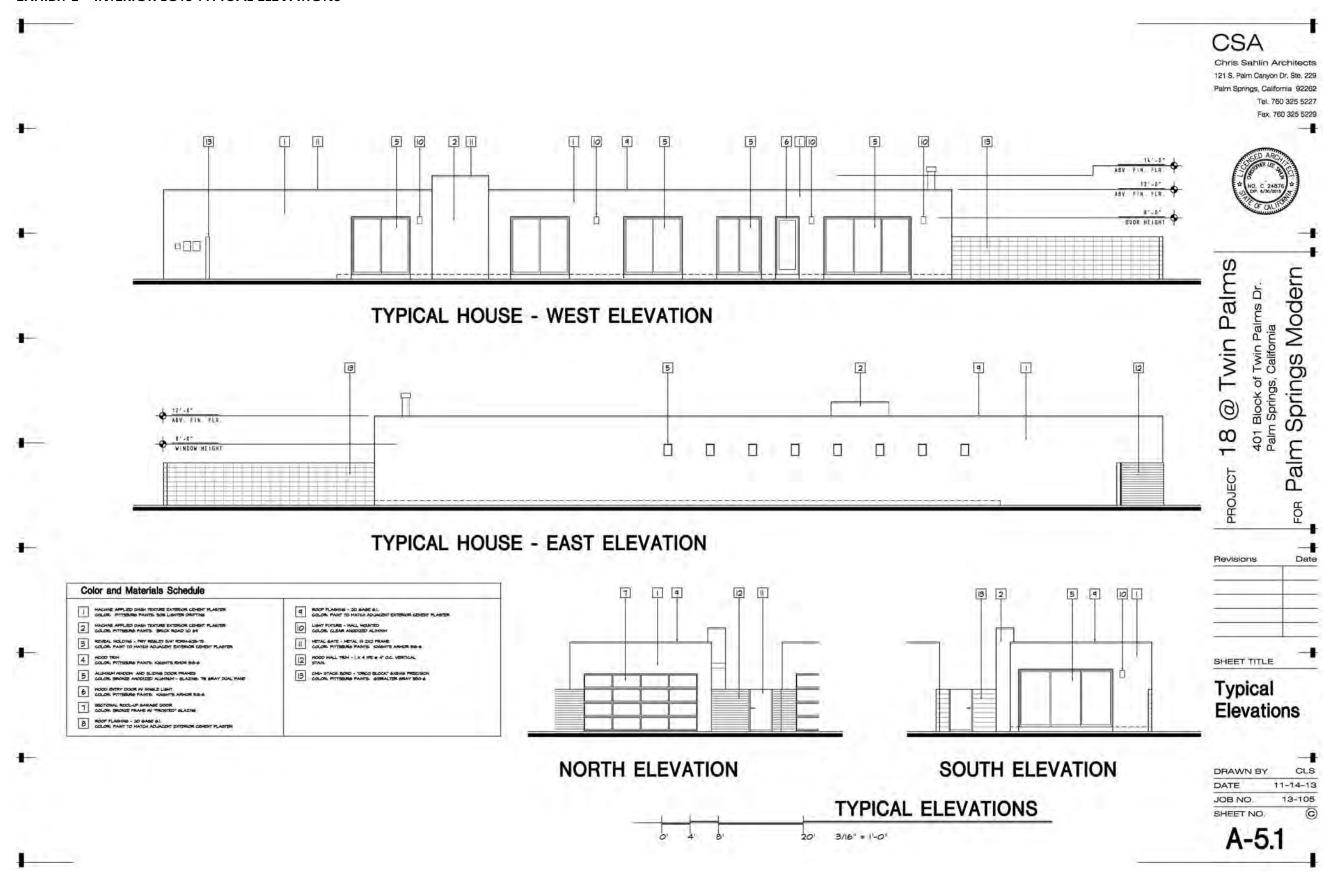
EXHIBIT E – INTERIOR LOTS TYPICAL ELEVATIONS
